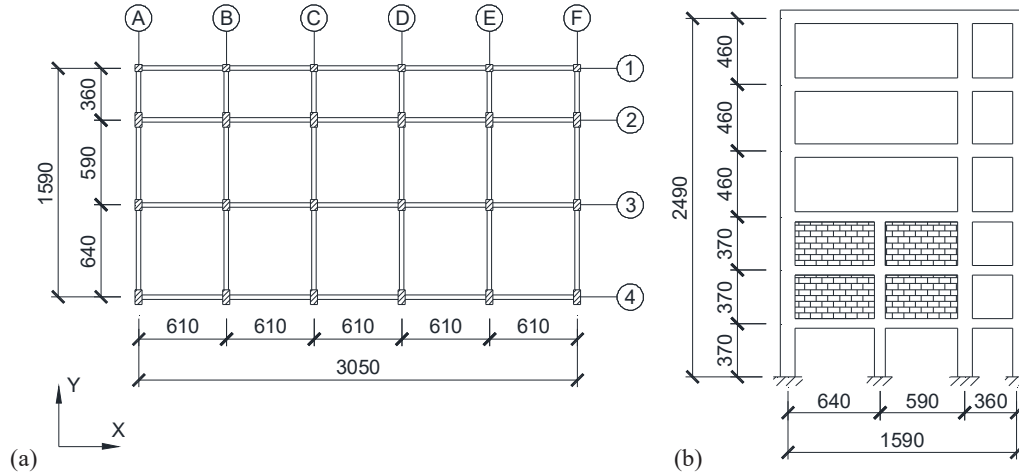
Code-designed infilled RC URM building: (a) second-story plan view of structural RC frames, (b) elevation view along Y-direction (transverse direction) of internal frames, (dimensions in cm).
